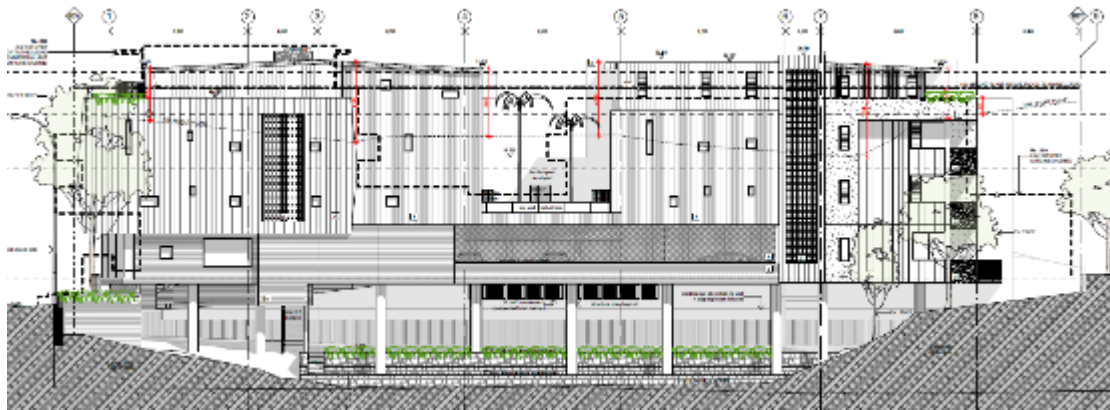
Elevation showing building height breaching elements when the 11 metre height standard is projected above the FPL
